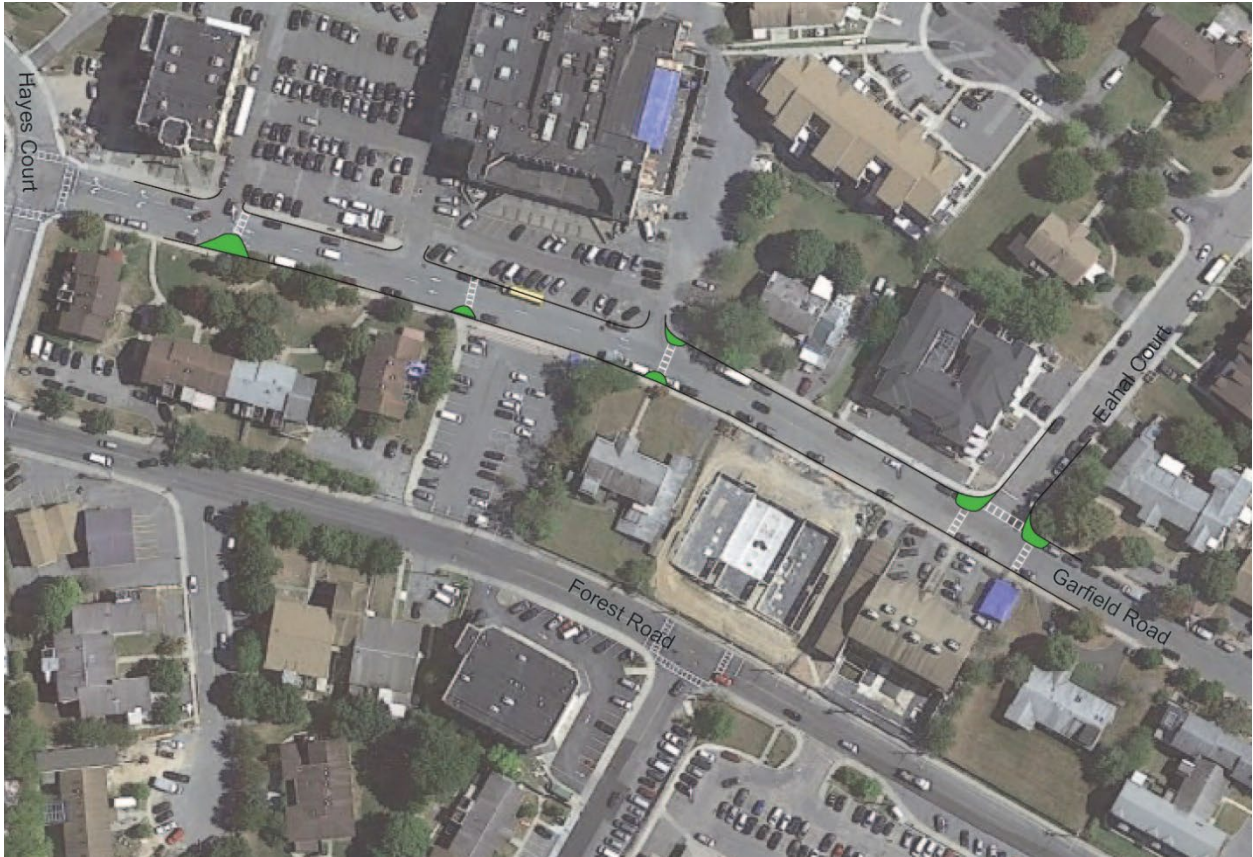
Garfield Road: One-way with Curb Extensions
